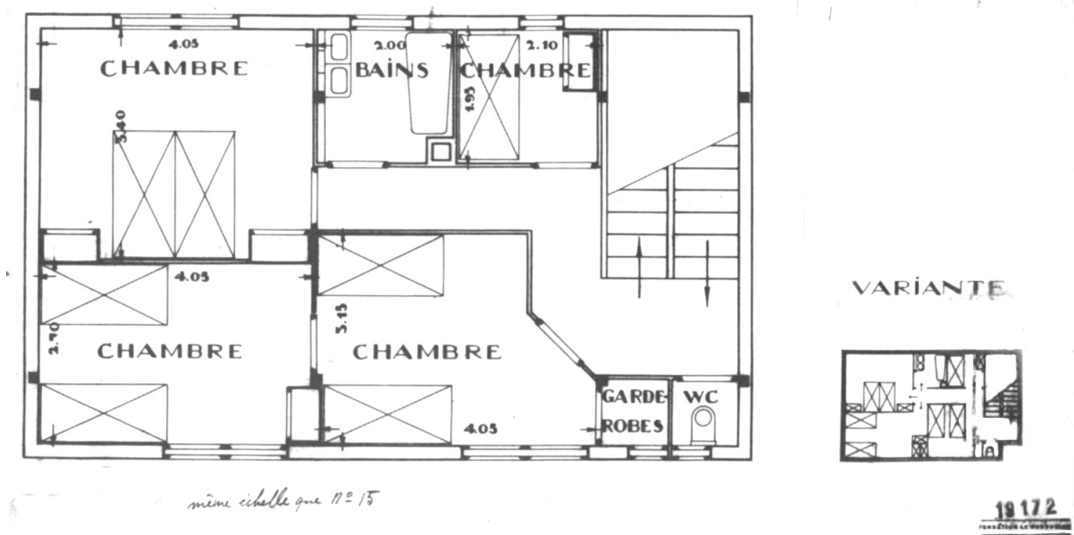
Maison Dom-Ino, 1915-1919, plan layout, variations of 1st floor
